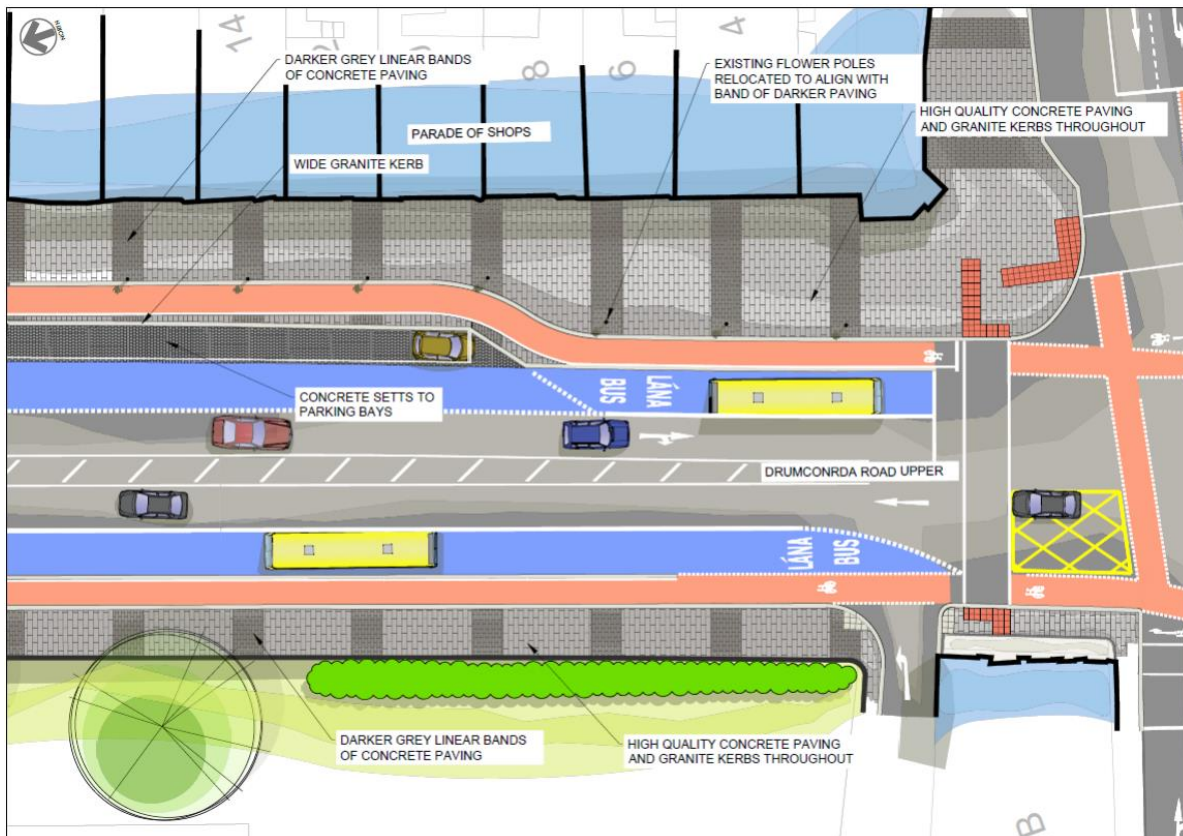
Drumcondra Road Upper Shopping Parade Indicative Design
